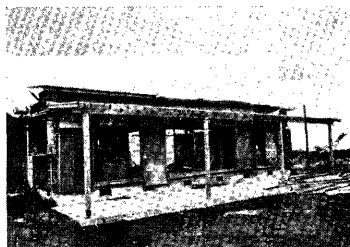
Roof failure due to uplift: wooden house.
